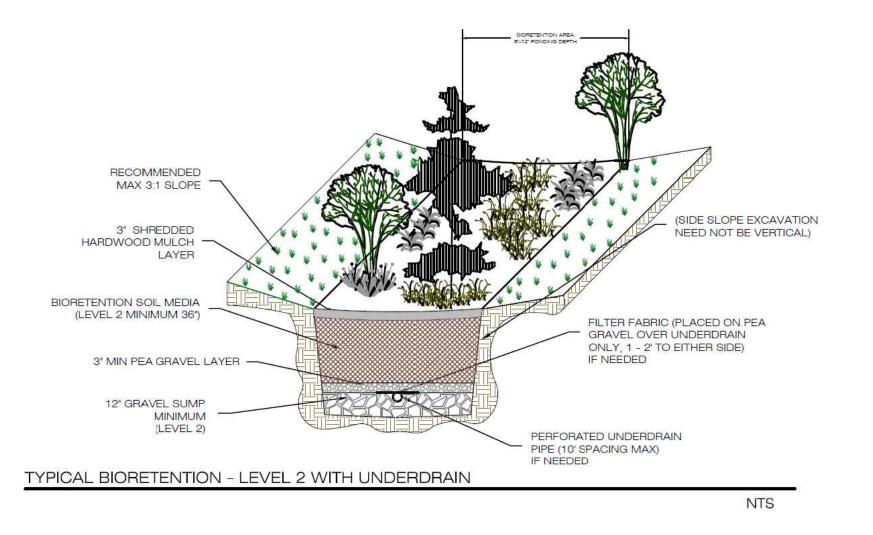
Typical Detail of Bioretention Basin Level 2 Design
